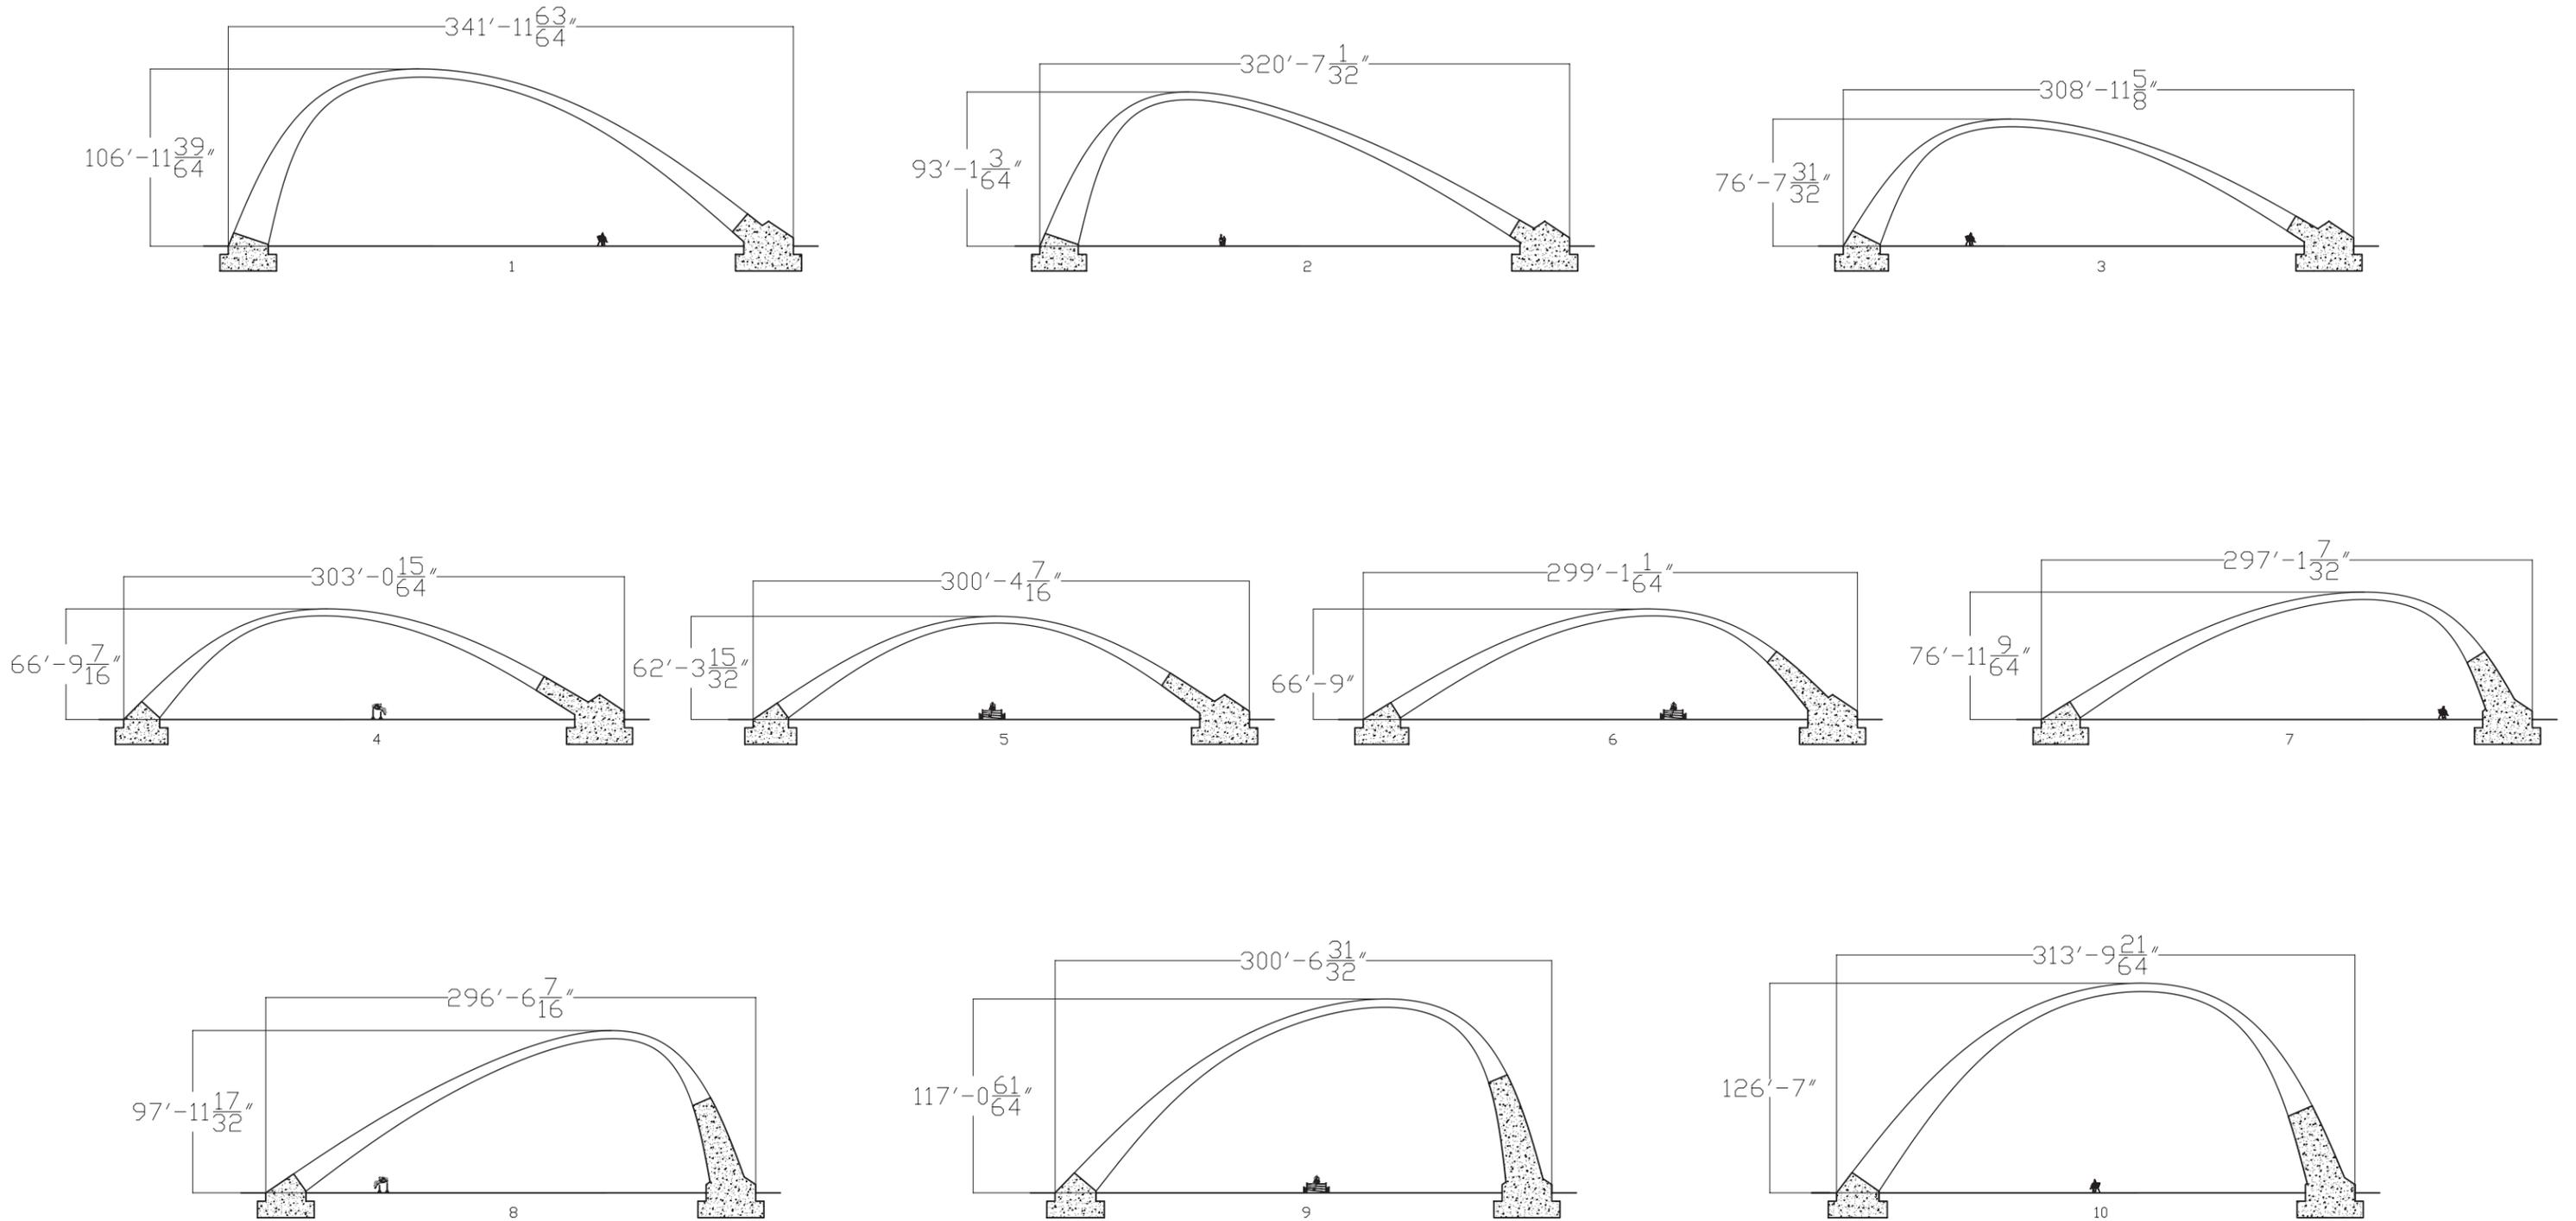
Elevations of Primary Arches (Arches 1–10)
